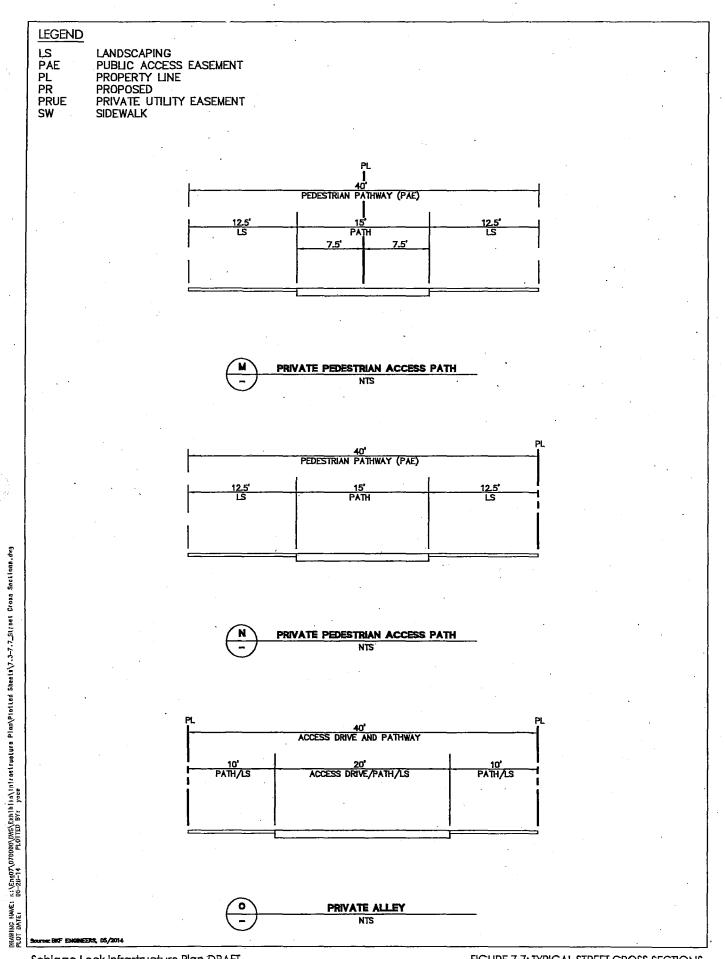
TYPICAL STREET CROSS SECTIONS
